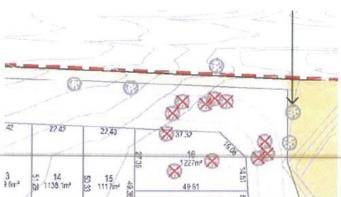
Detail of the Concept Plan where trees have been mapped as being retained but are within the 20m road and road verge area.
